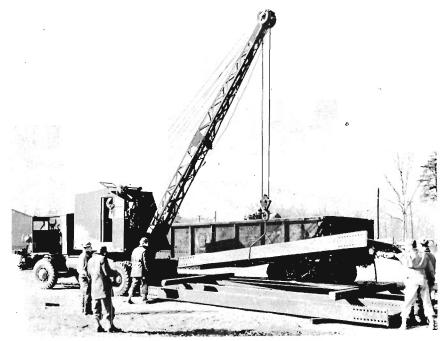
Unloading stringer sections from a gondola car with a \(\frac{1}{2}\)ection-yard truck-crane. The timber dunnage keeps the steel off the ground and facilitates placing wire-rope slings. Sections shown are for a 60-foot-span semipermanent highway steel bridge.
